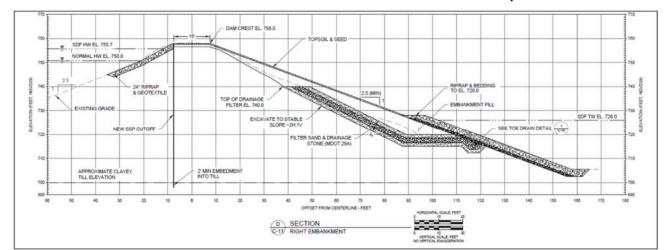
Cross Section View of Secord Dam Embankment Repairs
